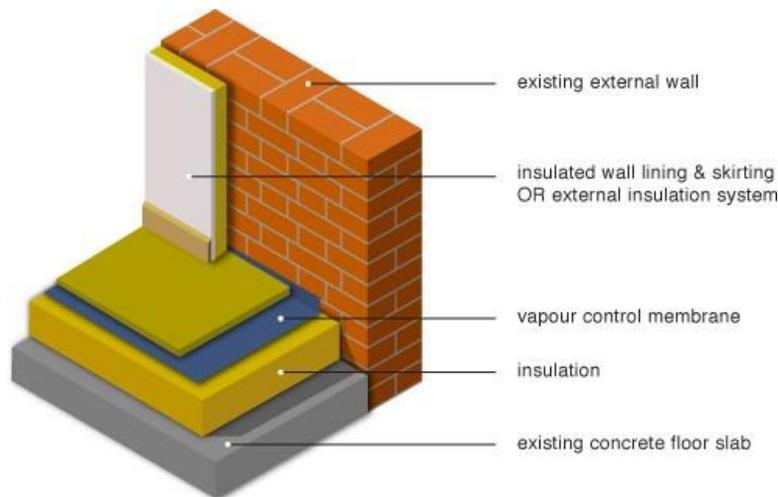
Concrete ground floor insulation (Source: www.greenspec.co.uk building design). (Chinazzo, 2013-14)
